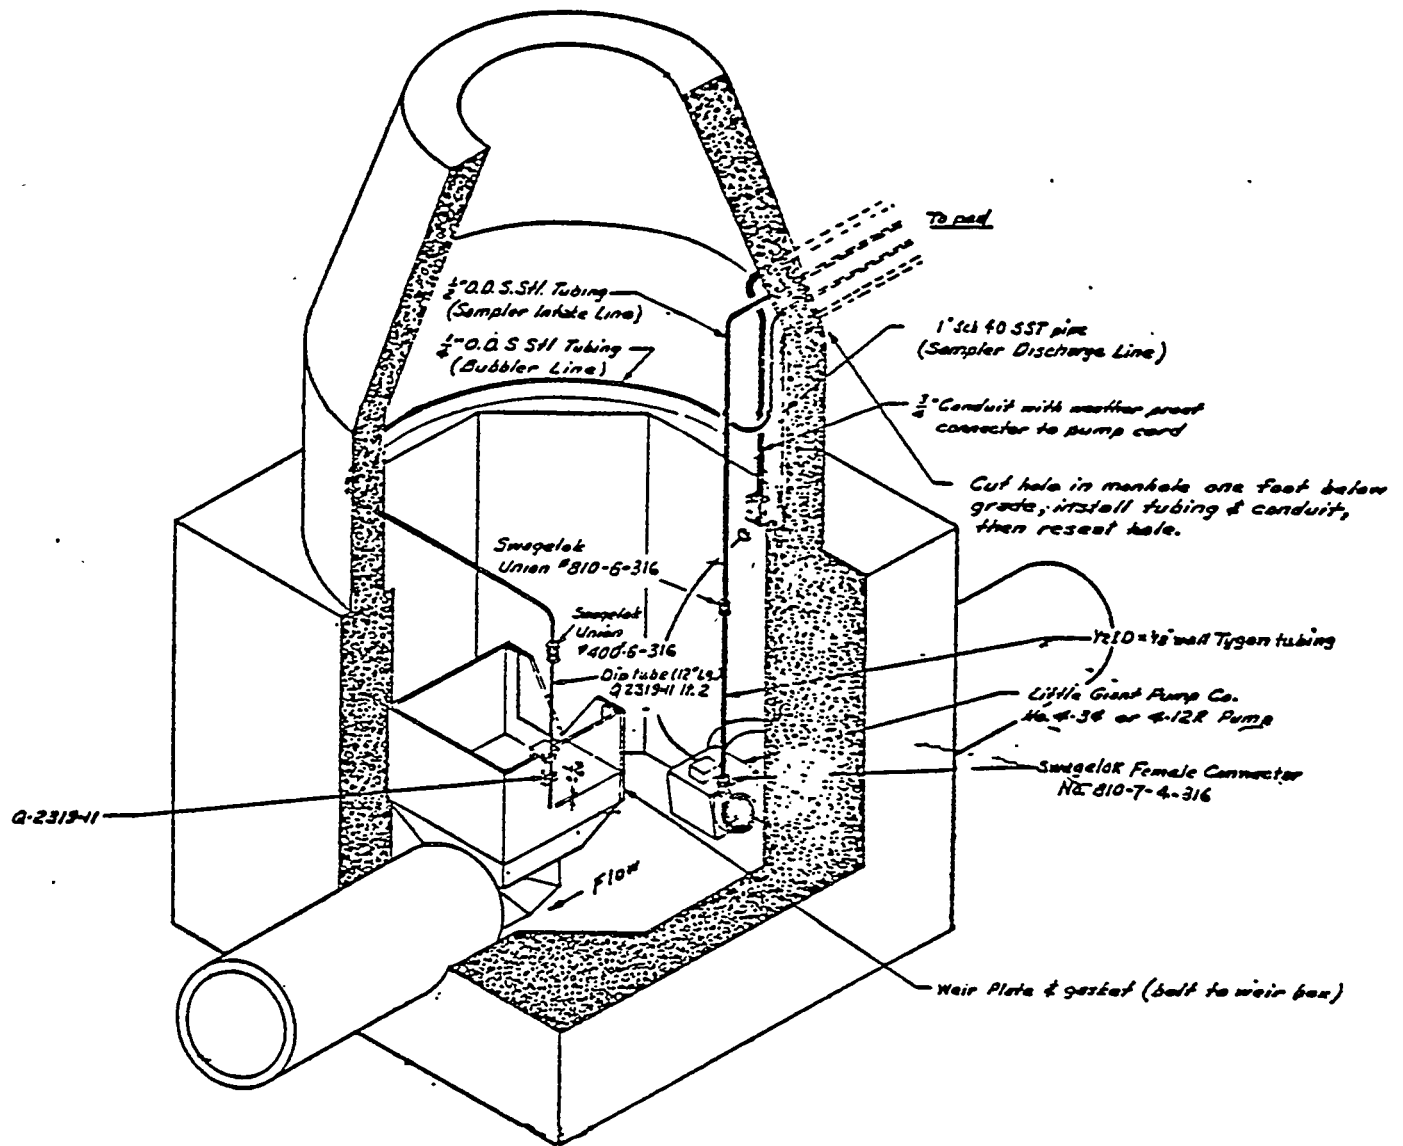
TYPICAL MANHOLE WITH WEIR BOX INSTALLATION
